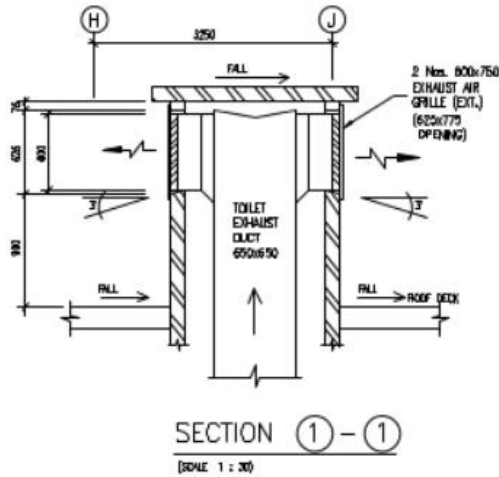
Sectional drawing for toilet exhaust duct in KLPAC
